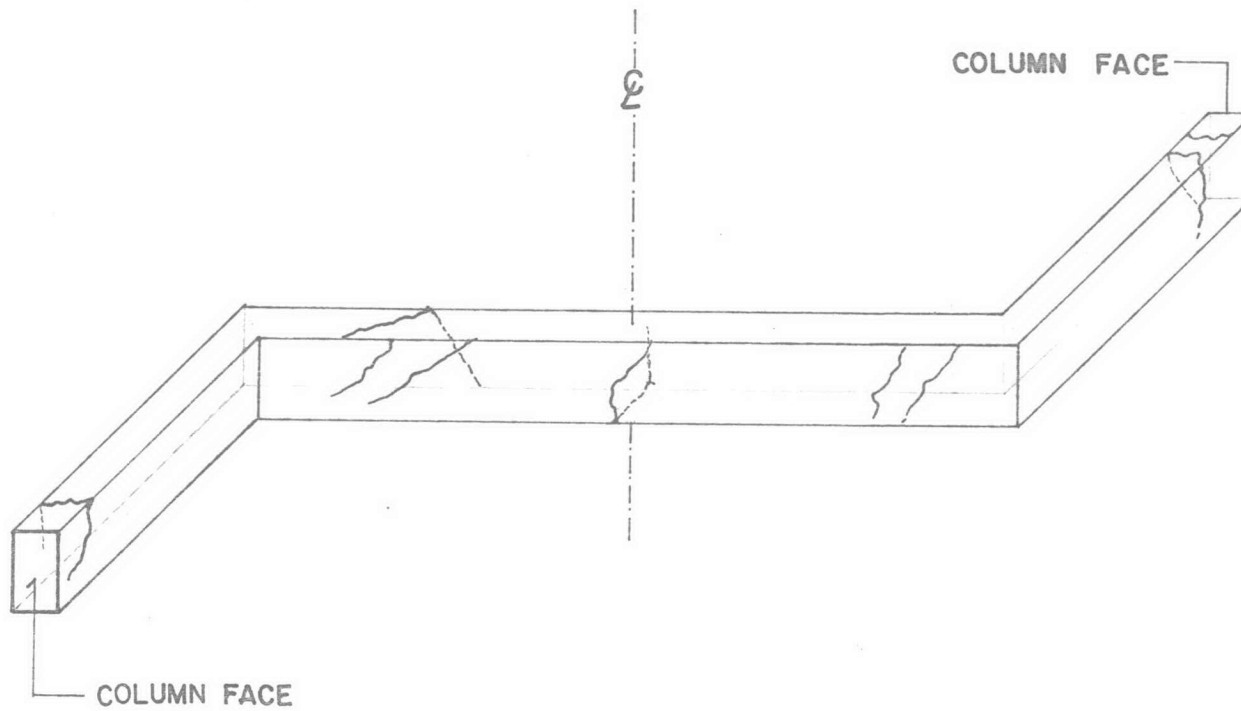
Sketch of Interesting Cracks on Z-beam Model
